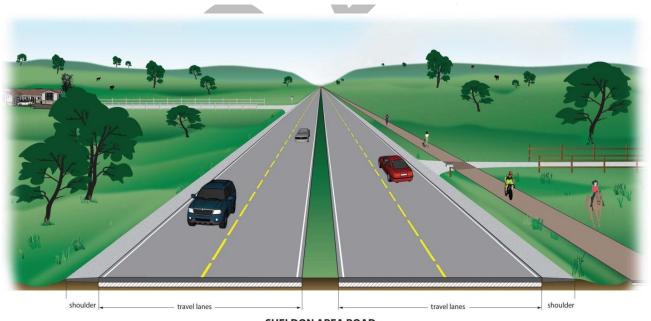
Typical 4 to 6-Lane Thoroughfare Cross Section
